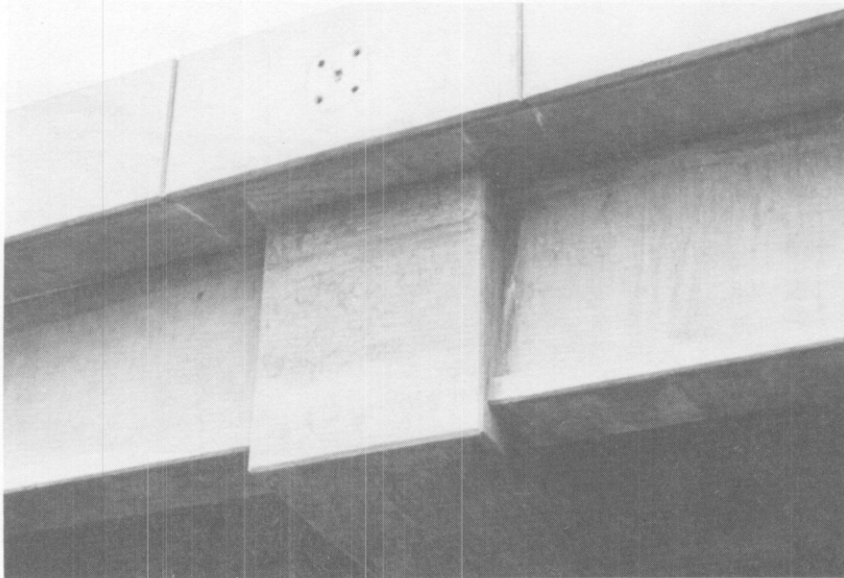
Closeup View of Pier No. 2 of Anderson Road Overpass
